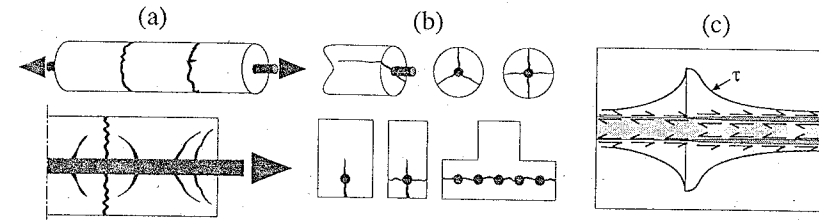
Cracking in bar pullout: (a) Transverse cracks; (b) longitudinal (splitting) cracks; (c) shear-slip interfacial crack.
